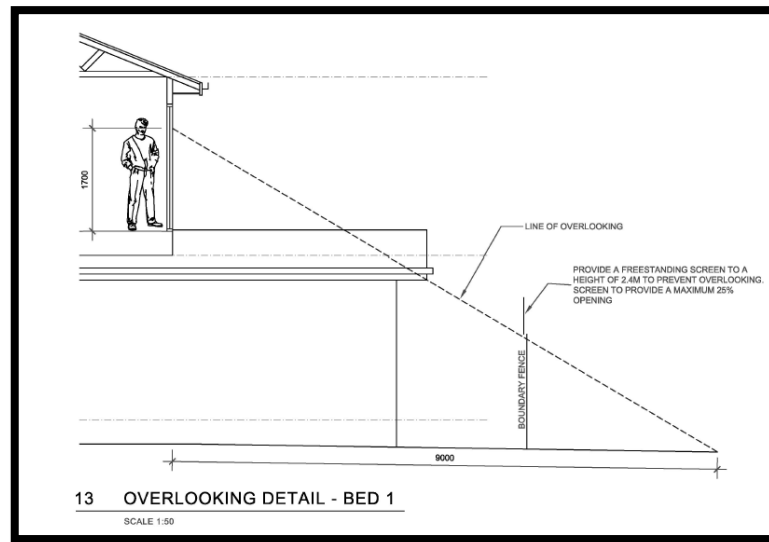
section plan demonstrating overlooking detail.<sup>6</sup>
